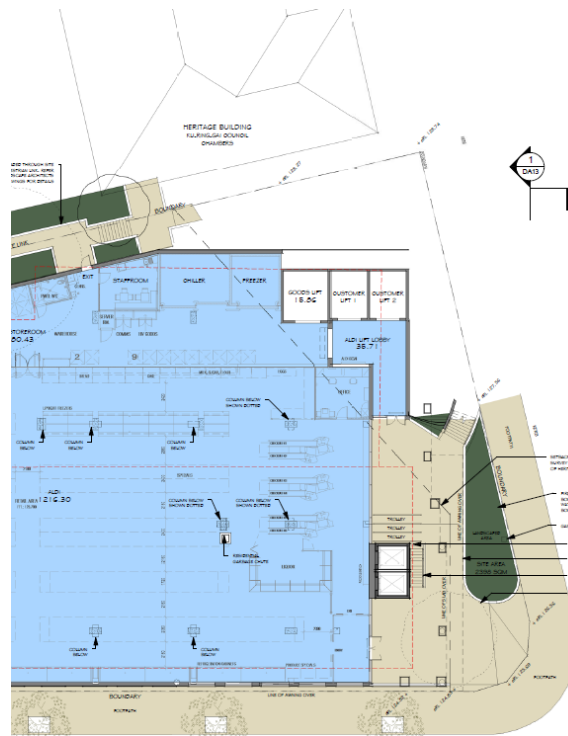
Second Pre-DA Scheme Floor Plan Ground
